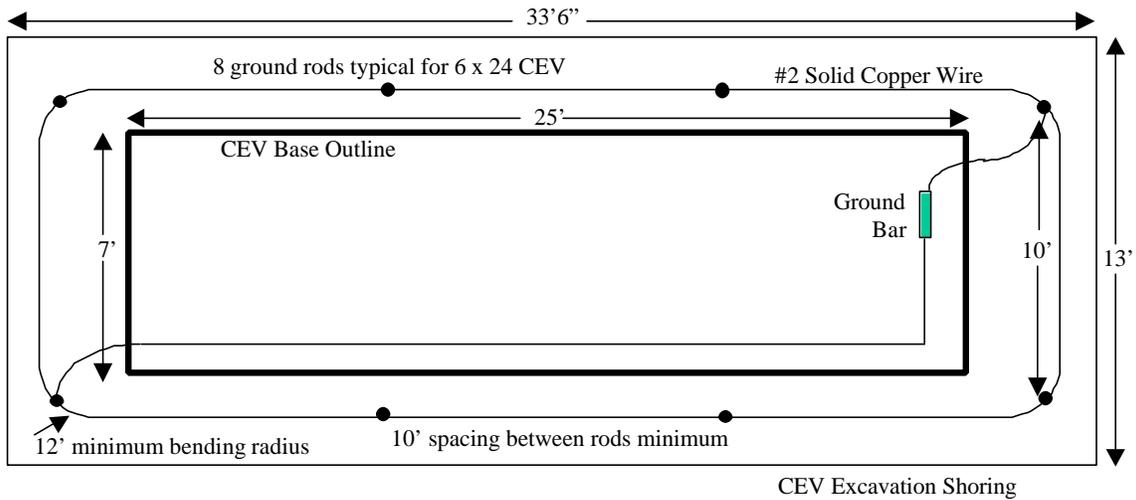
Typical CEV Excavation and Driven Ground Rod System
